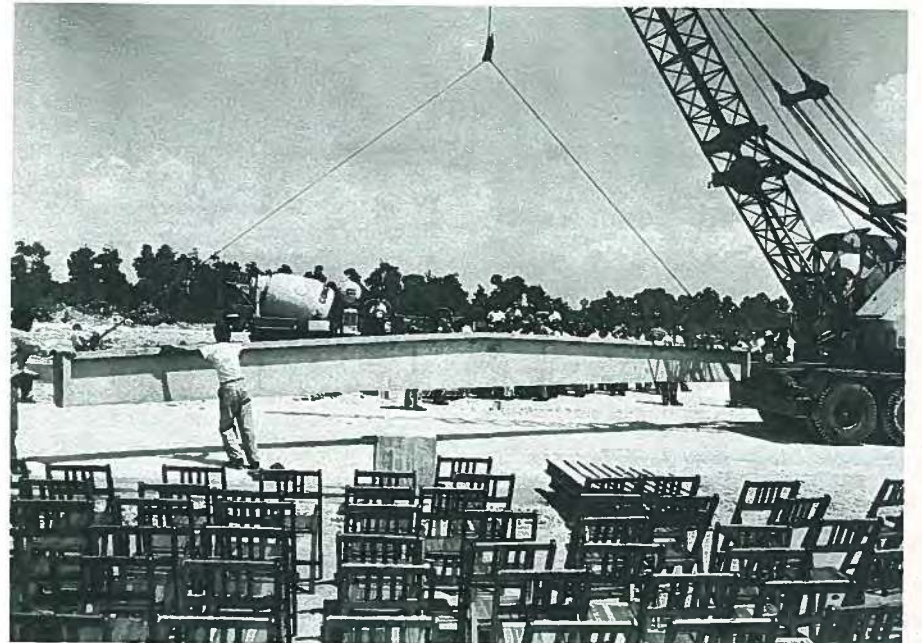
Variable section tee-joint being lifted by crane prior to testing at Cone Brothers Construction Co., Tampa, Florida.
